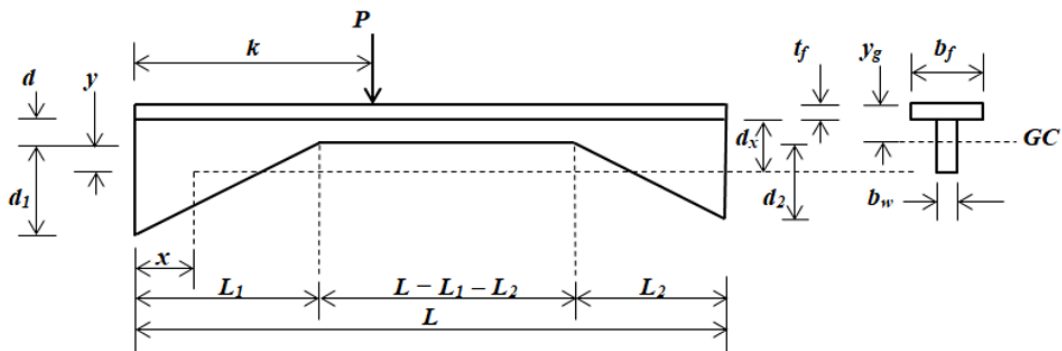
T-shaped beam with straight haunches under a concentrated load
